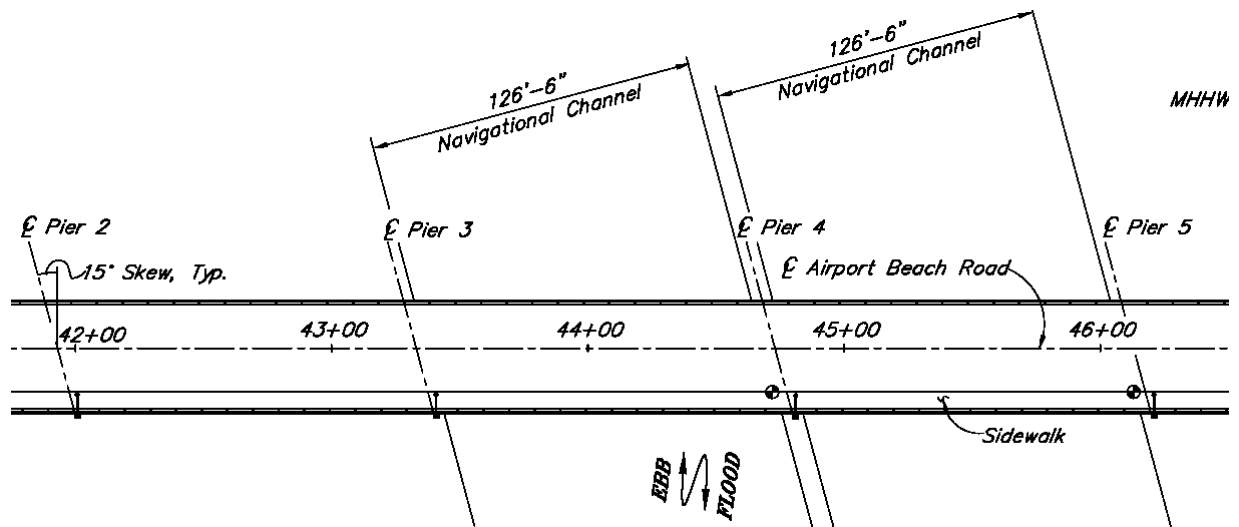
Bridge plan view indicating navigation channel width dimensions. (Source: Alaska DOT)
